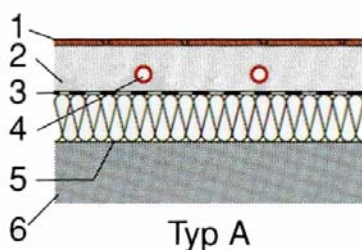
Floor structure type A (EN15377-1 and EN1264-2) [27]:
